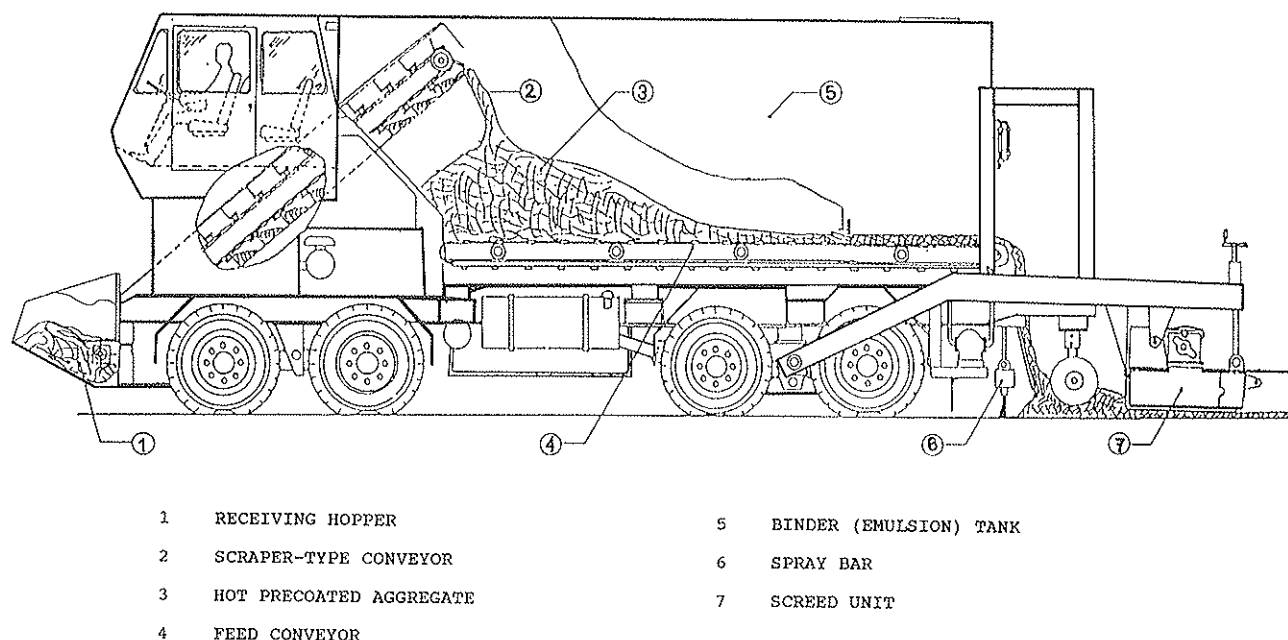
Schematic of single-pass machine for rolling Novachip friction course.
